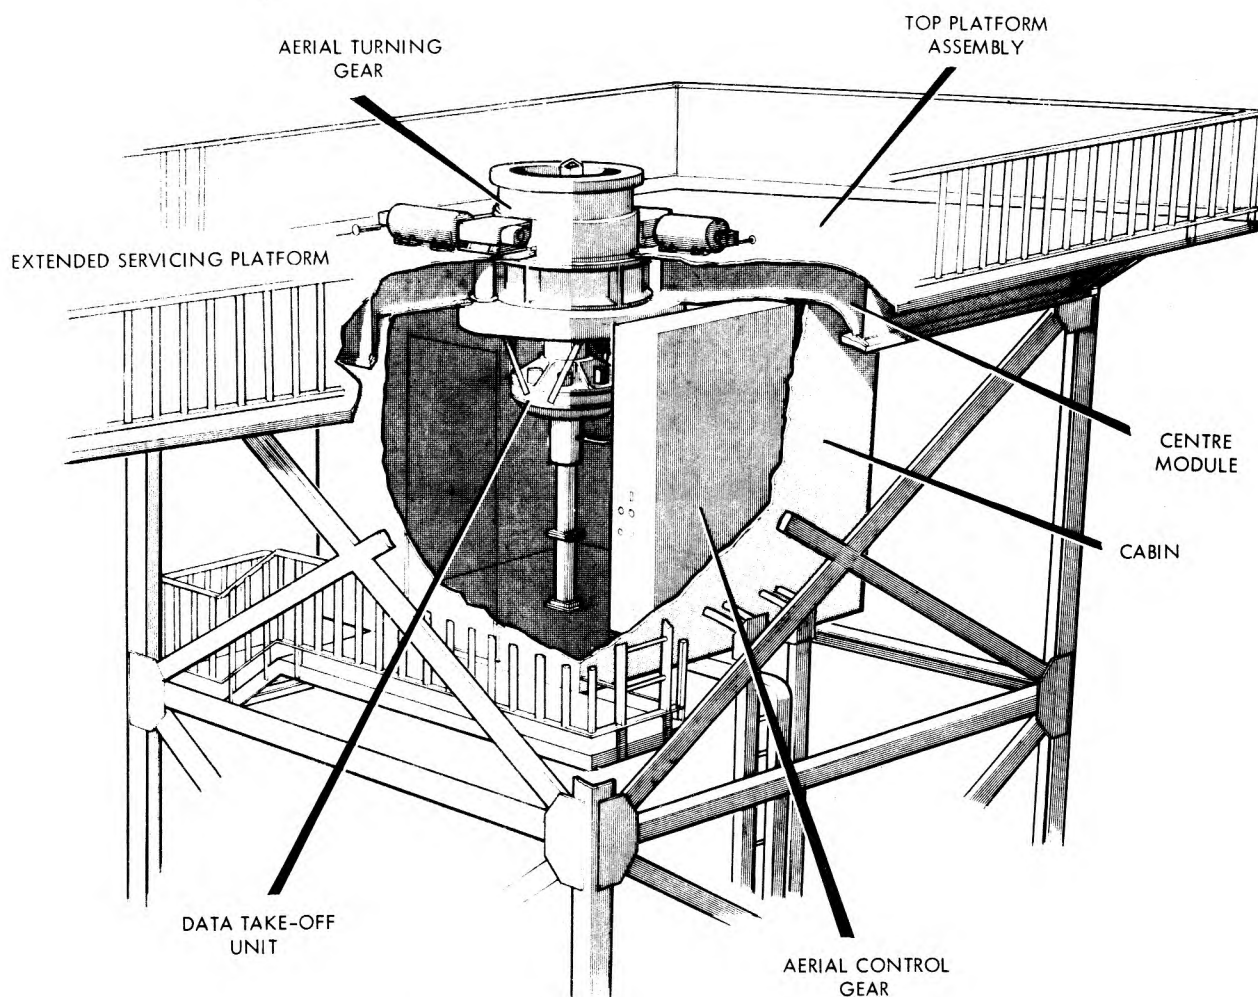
TOWER, CABIN AND PLATFORM ASSEMBLIES
